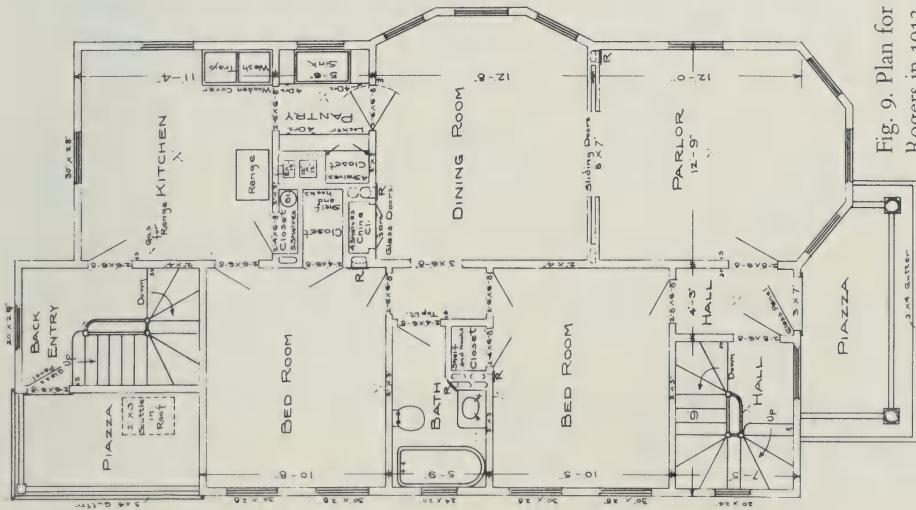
Plan for the second floor of 373 Boston Street, a triple-decker designed by H. W. Rogers in 1912. Plan courtesy of the Building Department of the City of Lynn.
